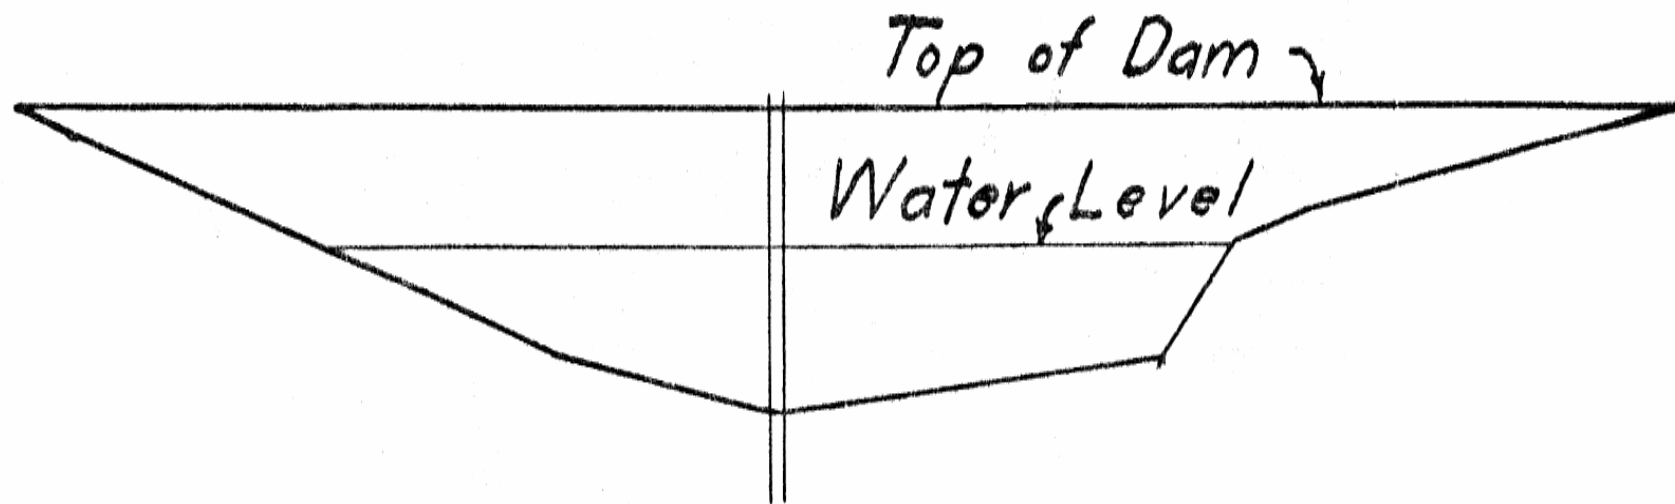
provides the Wyoming State Engineer's Office (SEO) permit application Johnson No. 1 Reservoir dam cross section.
